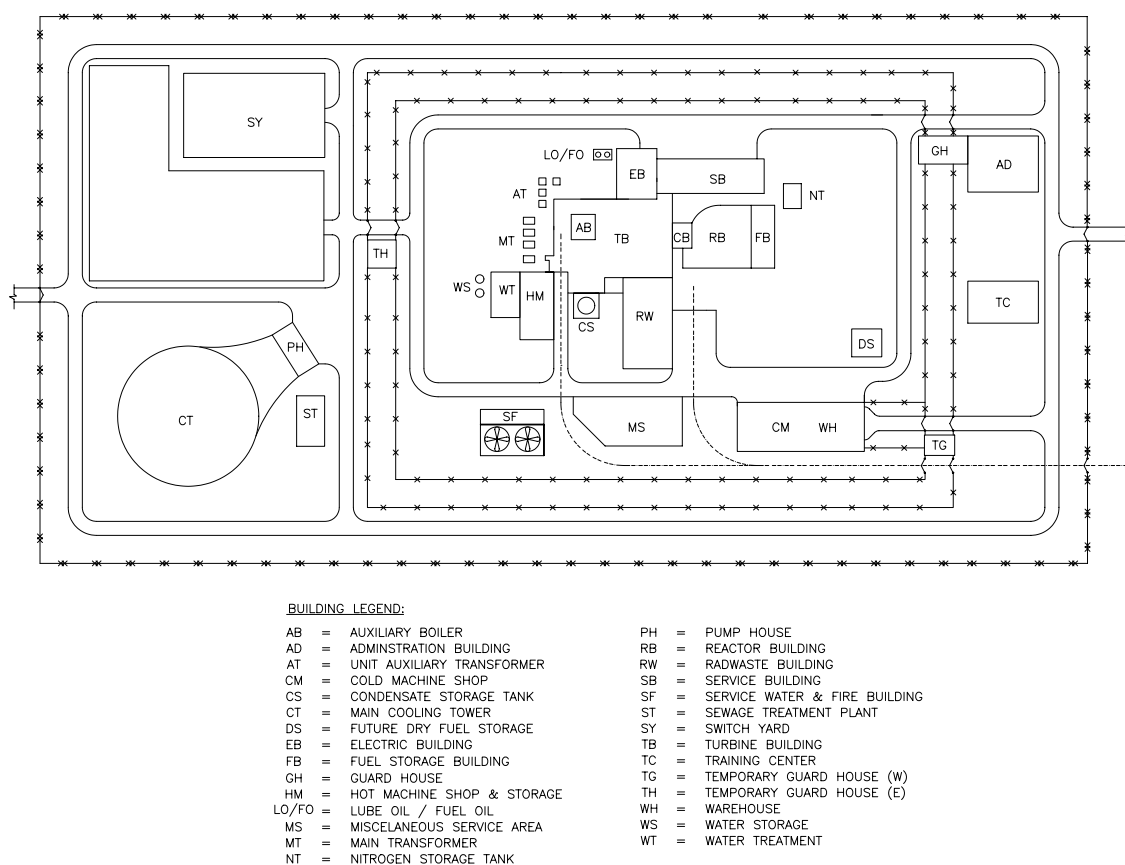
ESBWR Plant Layout, Site Plot Plan
